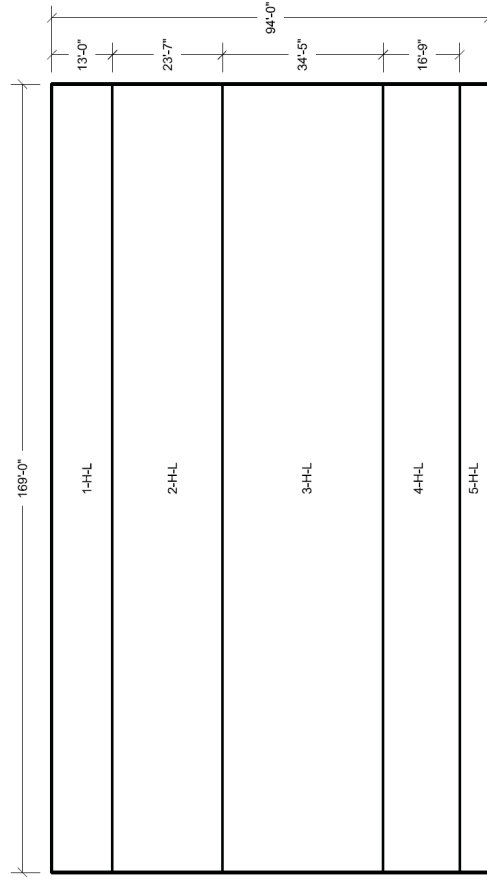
H.6-12: PUMP HOUSE FOUNDATION MAT
